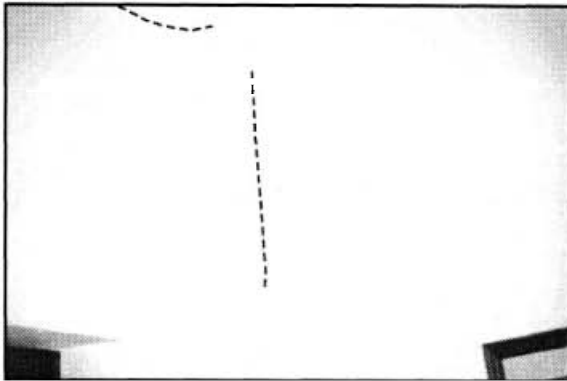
Purcell House. Minor vertical cracking at the interface of two butting walls (dotted line along crack).
